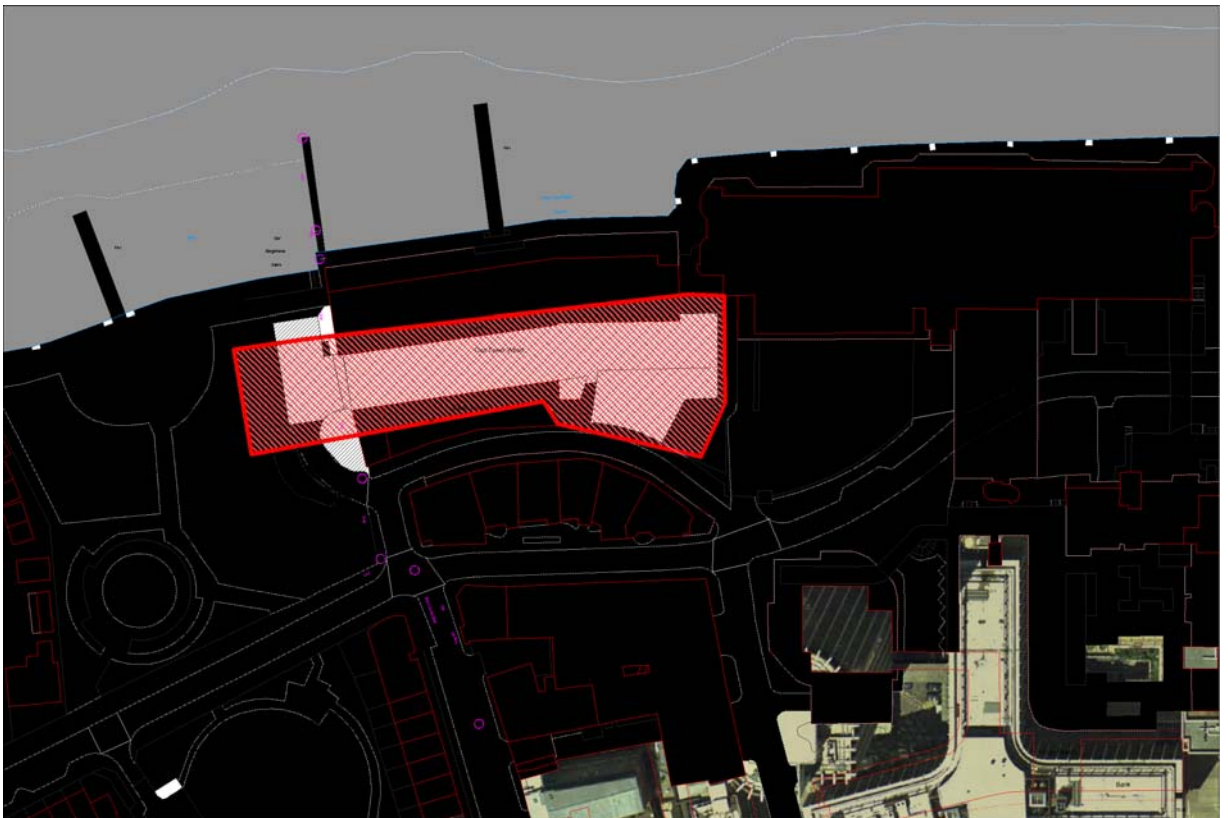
The Oxo Tower Area with the Indication of Floor Planes
